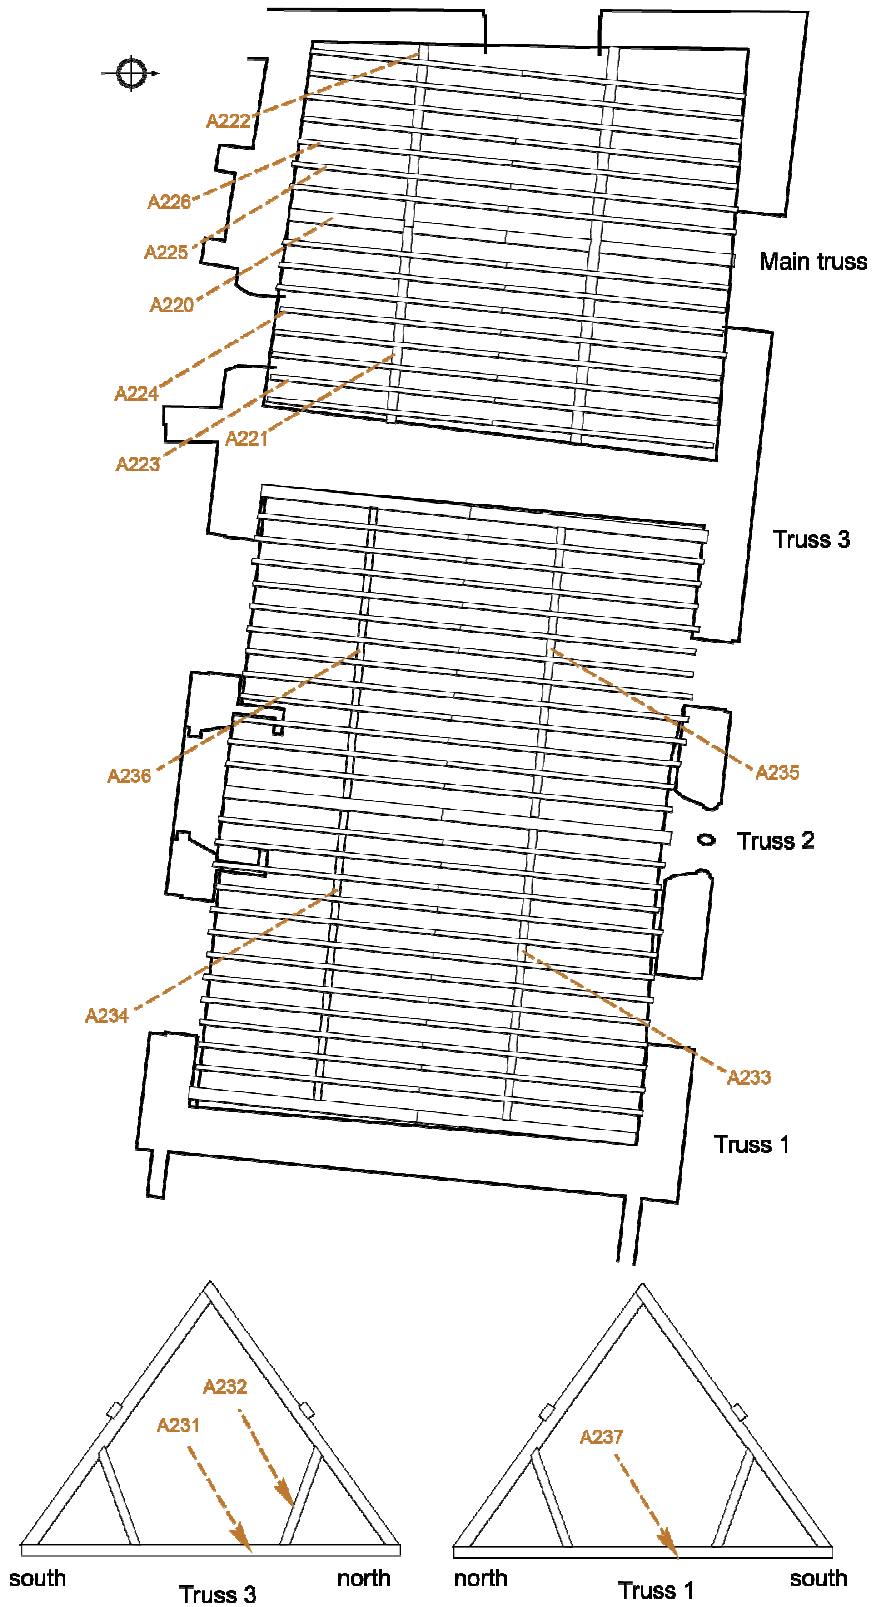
Roof structures in the north-west corner of the stables, showing the locations of samples APT-A220-6 and A231-7
